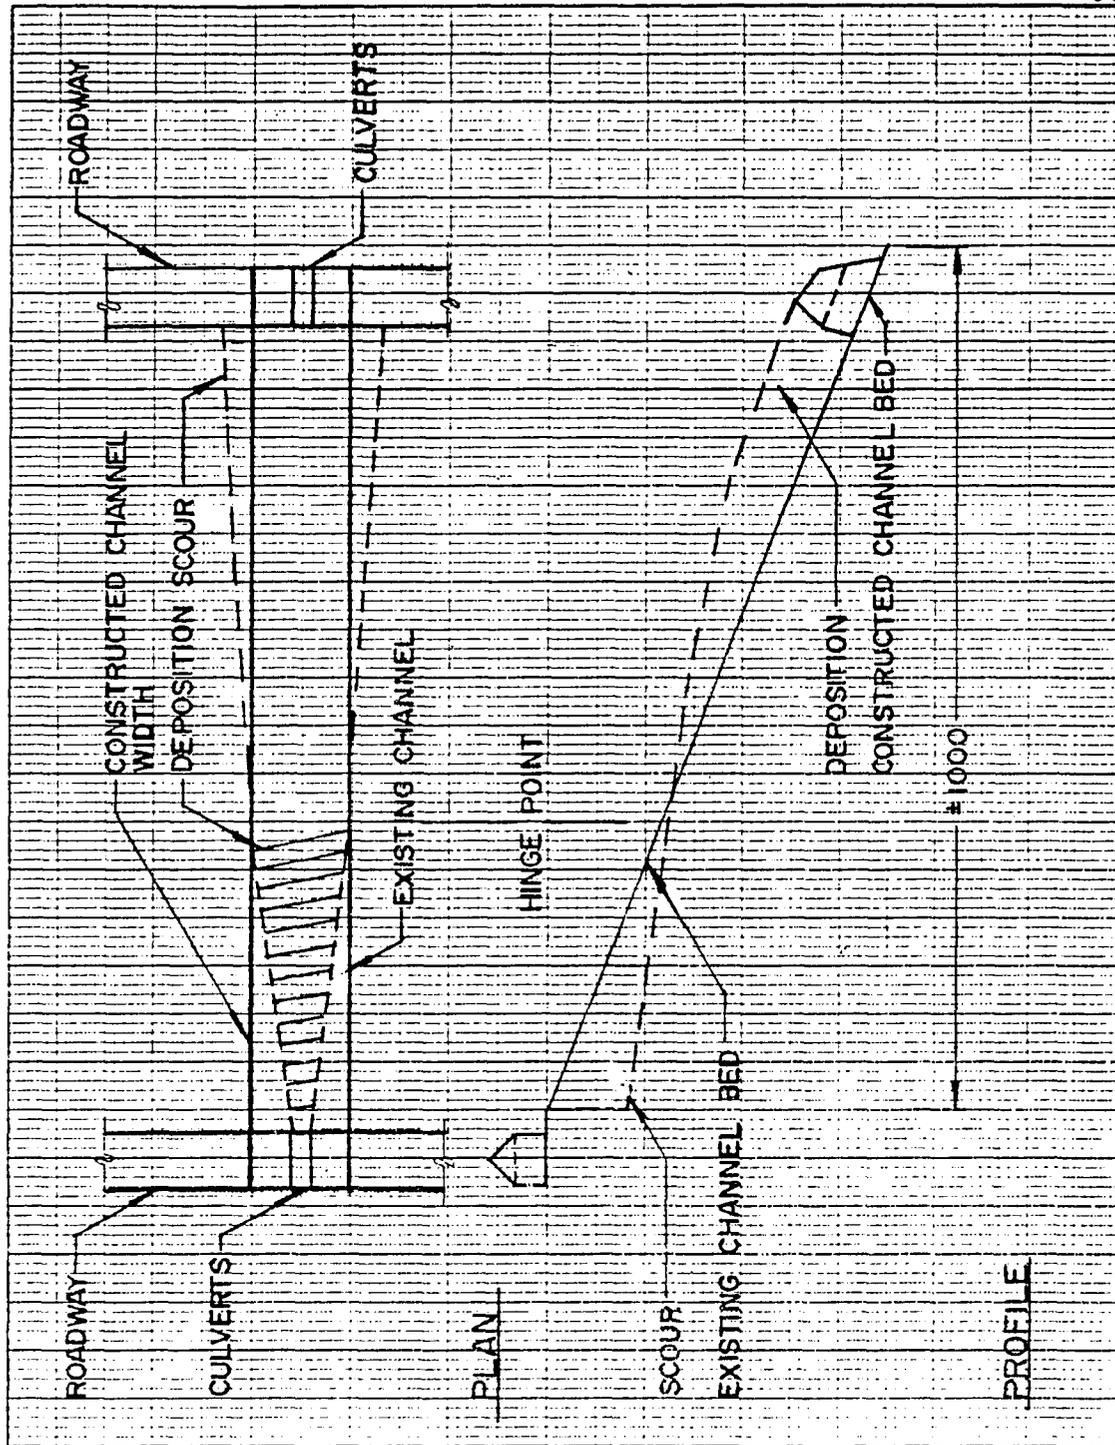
Excessive Slope, Channel Adjustment Plan and Profile Views
